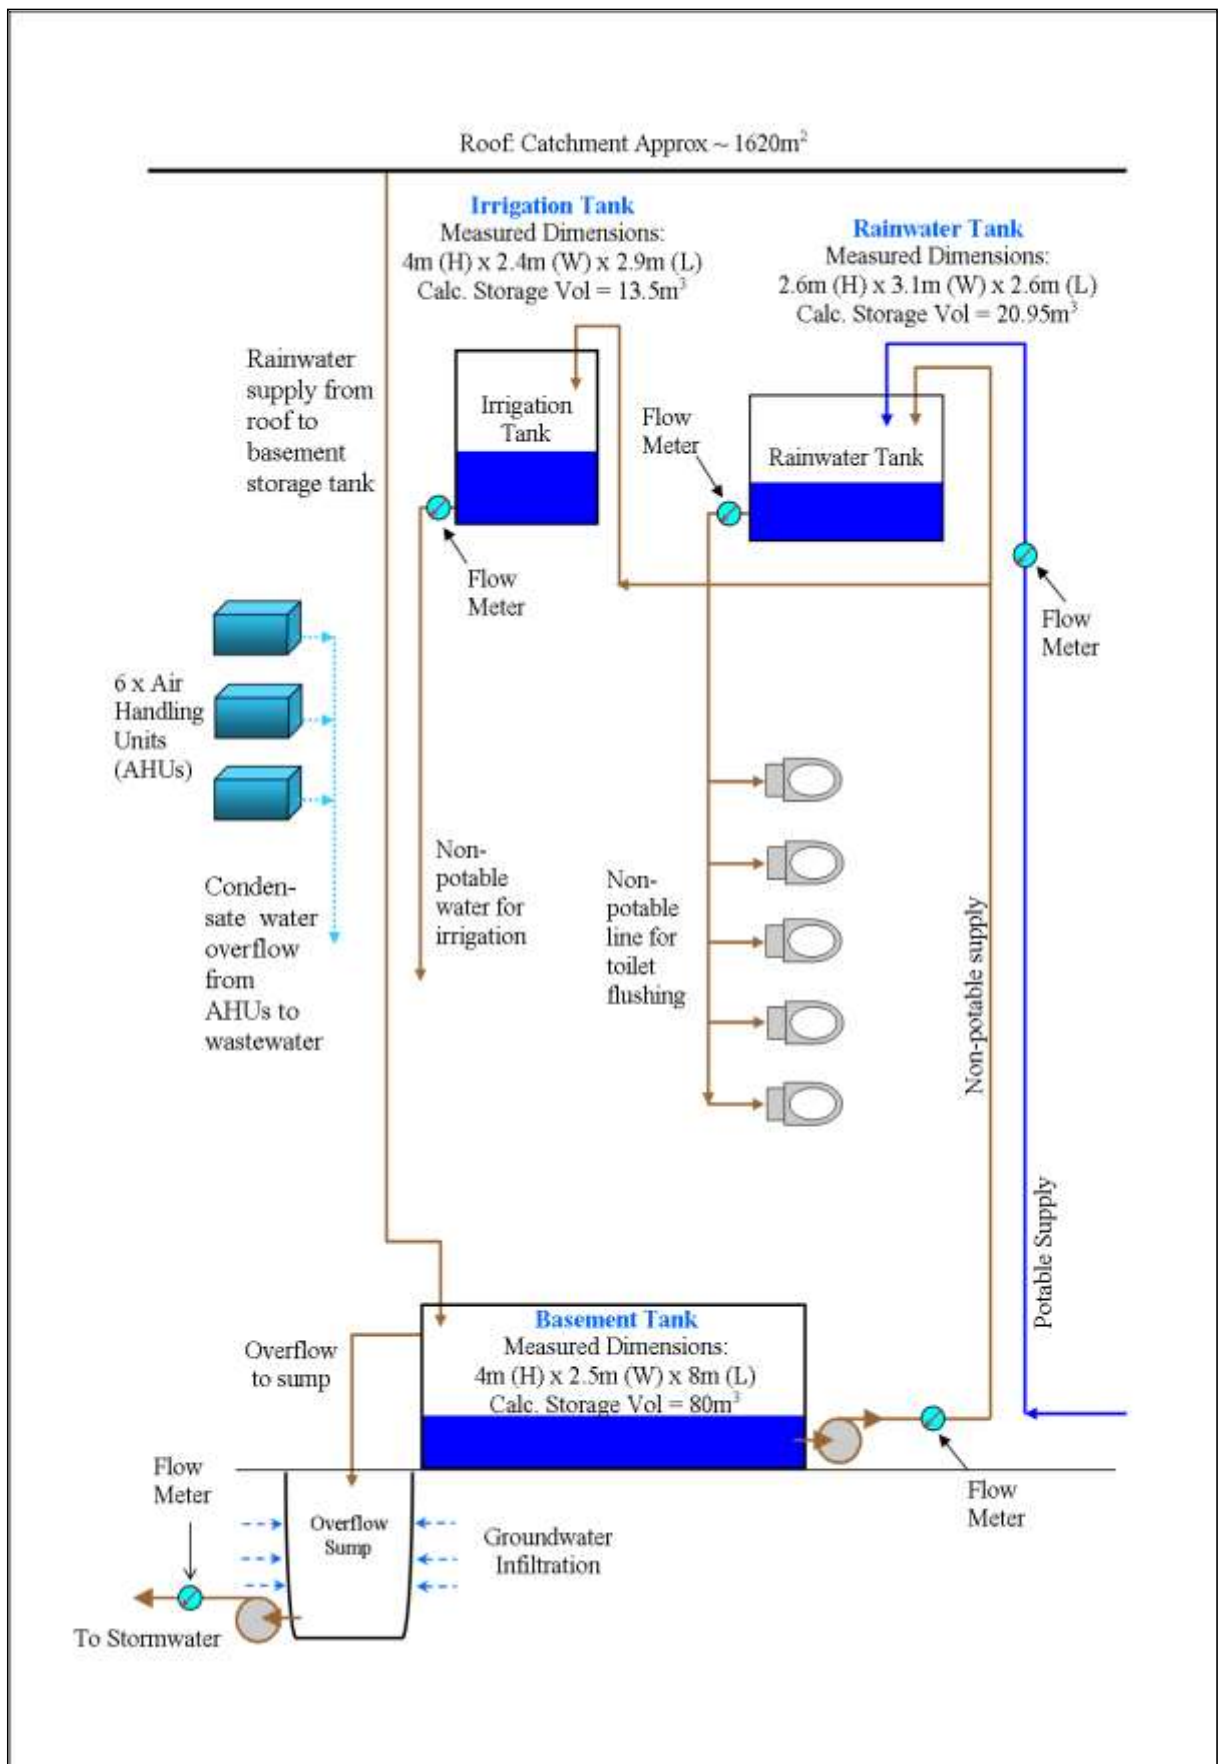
Hydraulic circuit of Green Square North Tower rainwater harvesting system.
